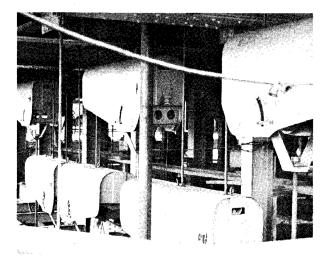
Upper supporting steel for water walls, superheaters, and reheaters.
